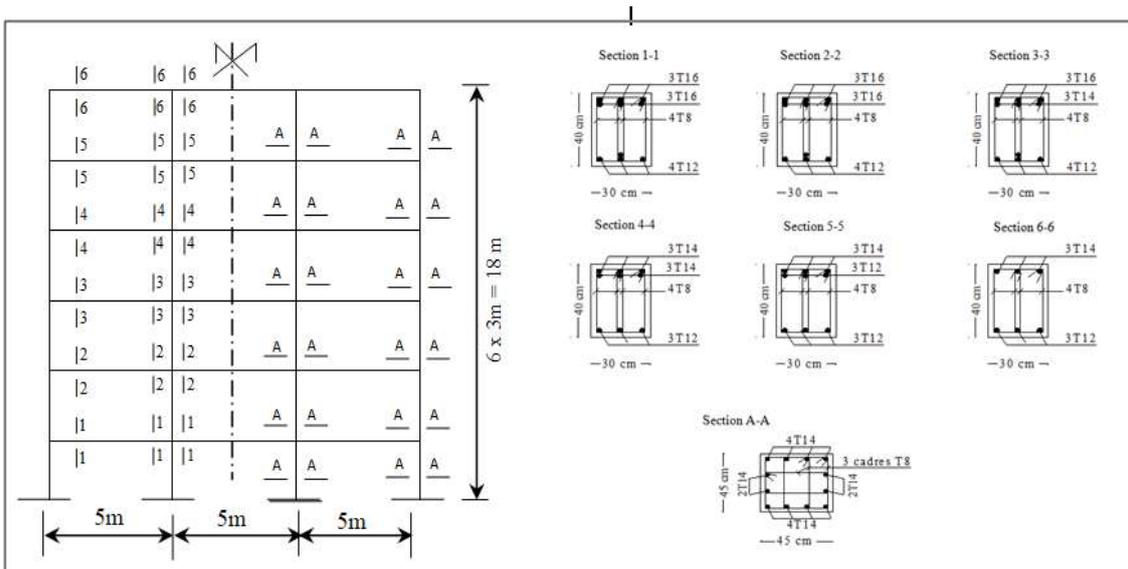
Dimensions and reinforcement details at both ends of the beams and the columns in the frame.
